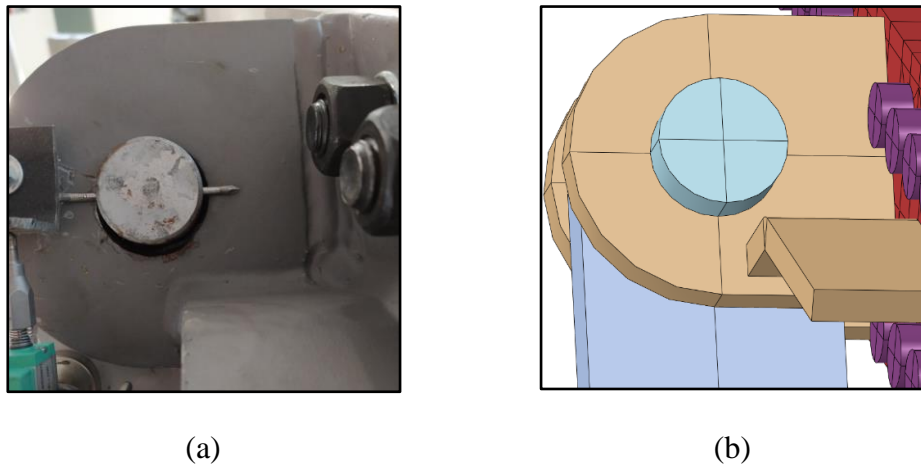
Detail of the pinned connection between the BRB and the column: (a) Test specimen, (b) Abaqus model
